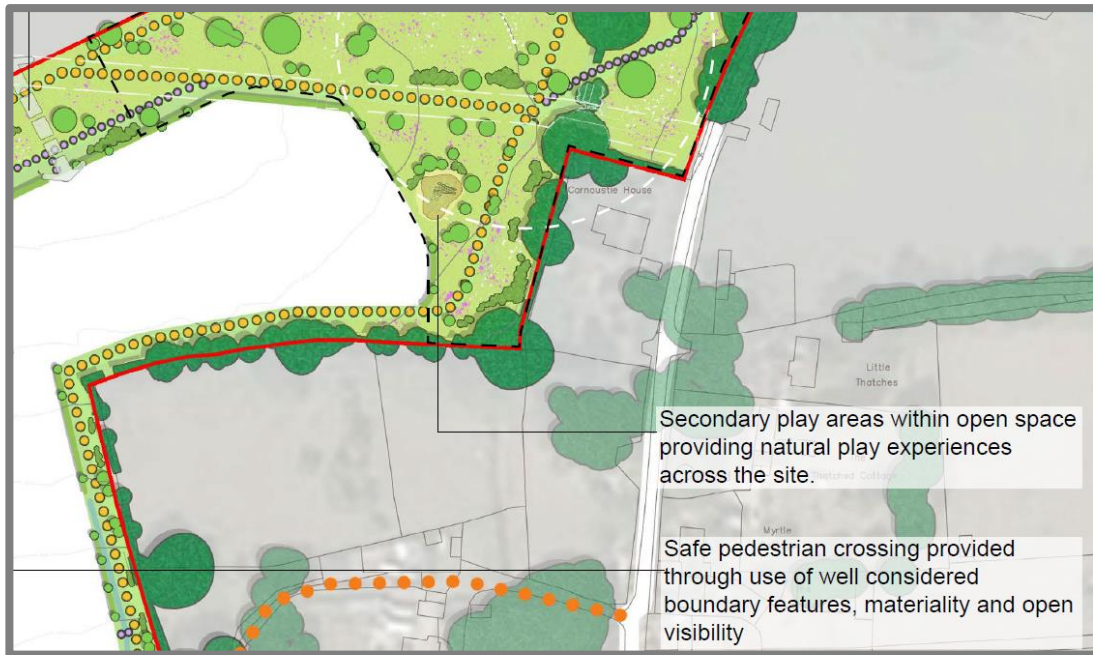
Extract from Bloor Homes Landscape and ANRG Framework Plan showing connectivity to the application site
